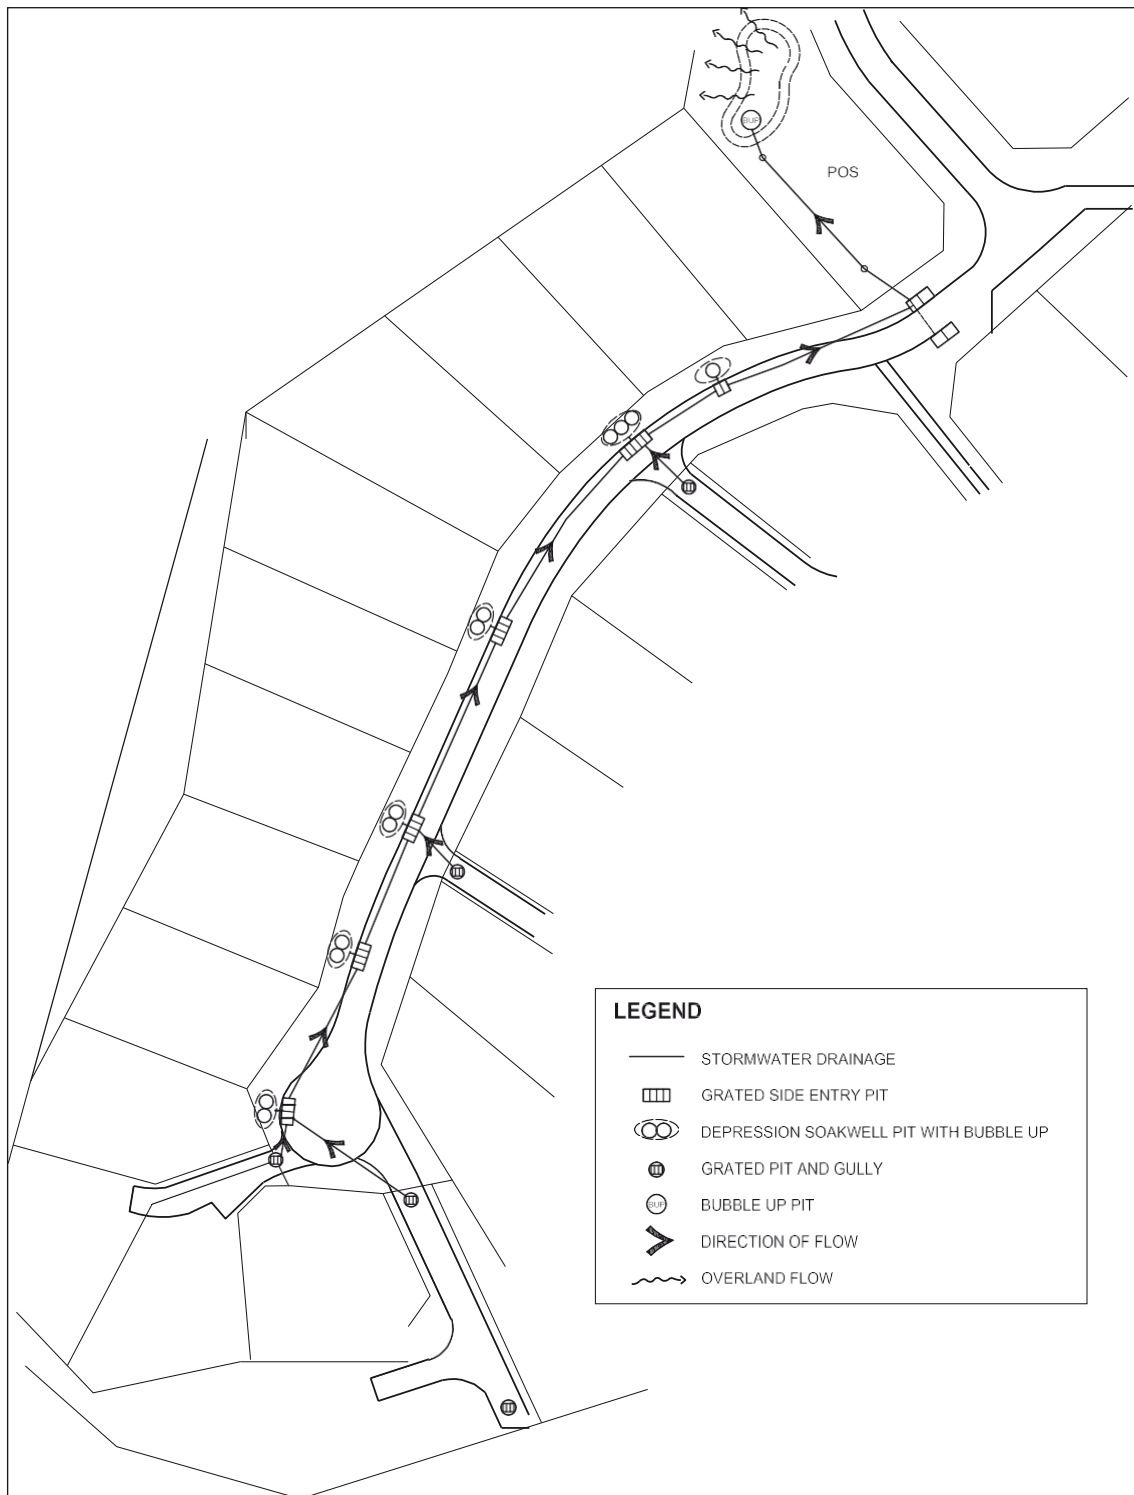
Boronia Ridge drainage plan. (Source: Department of Water.)
